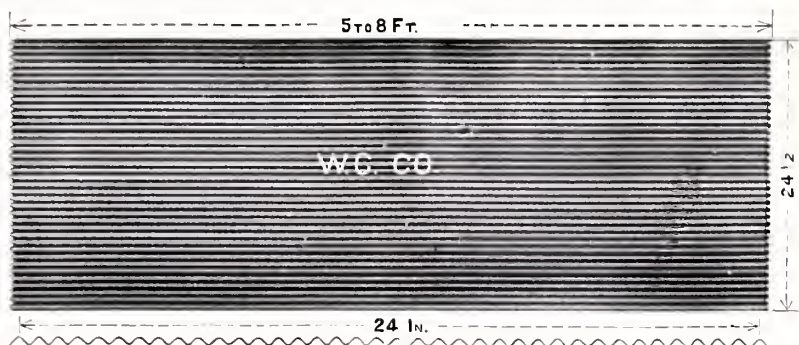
Shows our $\frac{5}{8}$ inch Corrugated Sheets used for Ceiling, Siding, Shutters and interior decoration.
